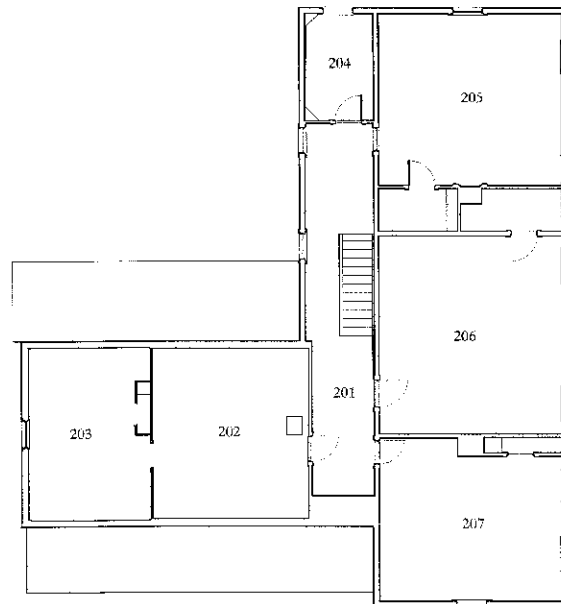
Second Floor Plan, Commanding Officer's Quarters
